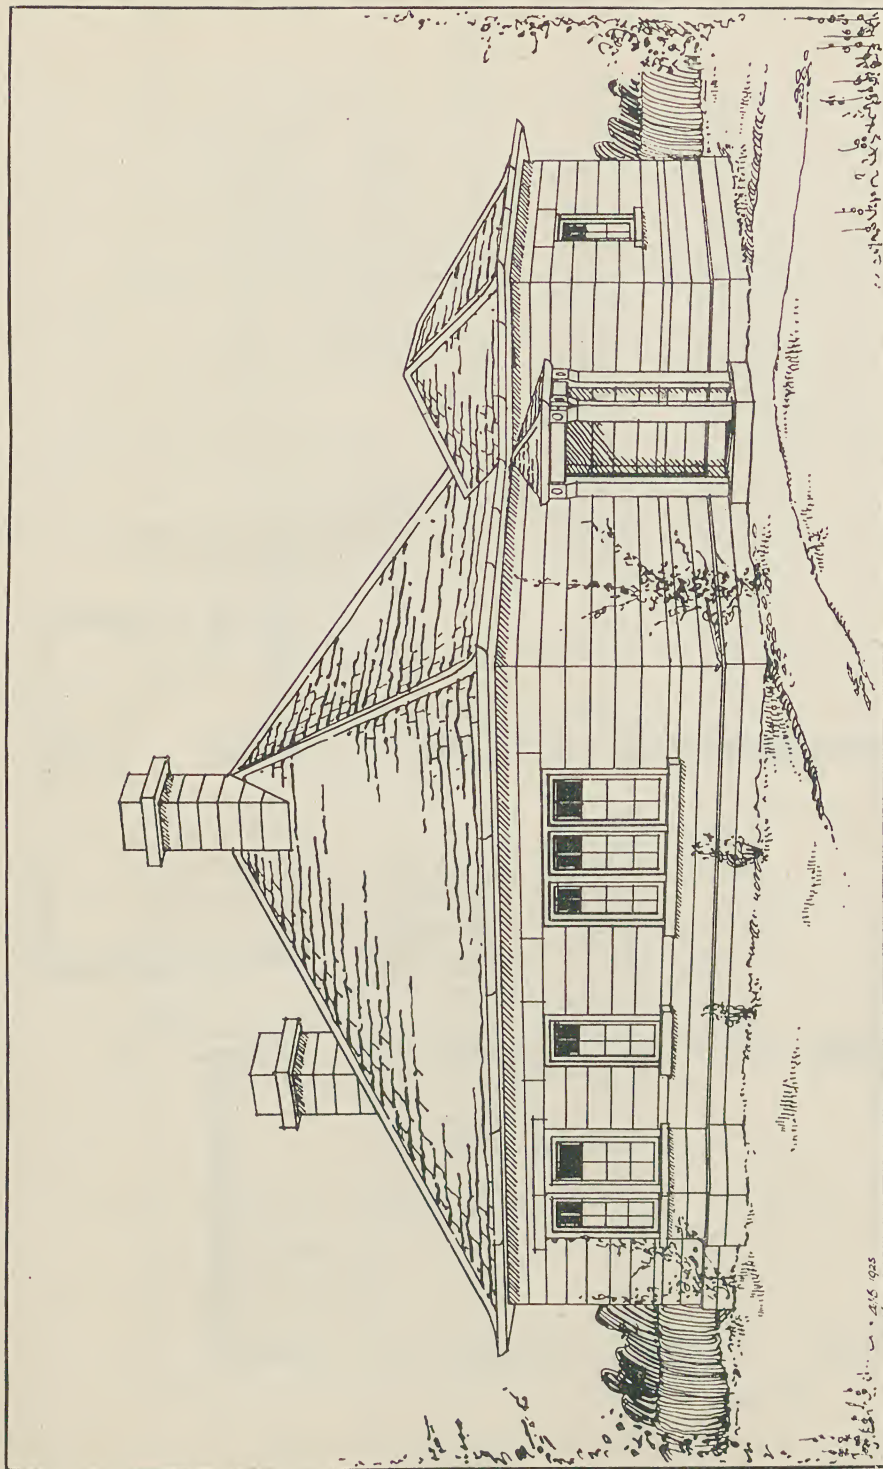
TYPE No. 5: WITH PITCHED ROOF.
